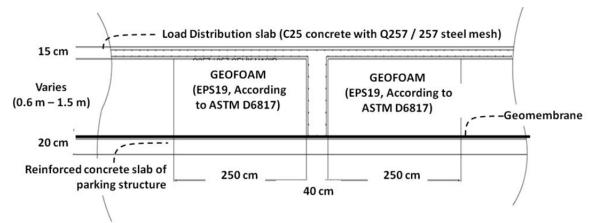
Typical cross-section of the lightweight geofoam flat roof application
